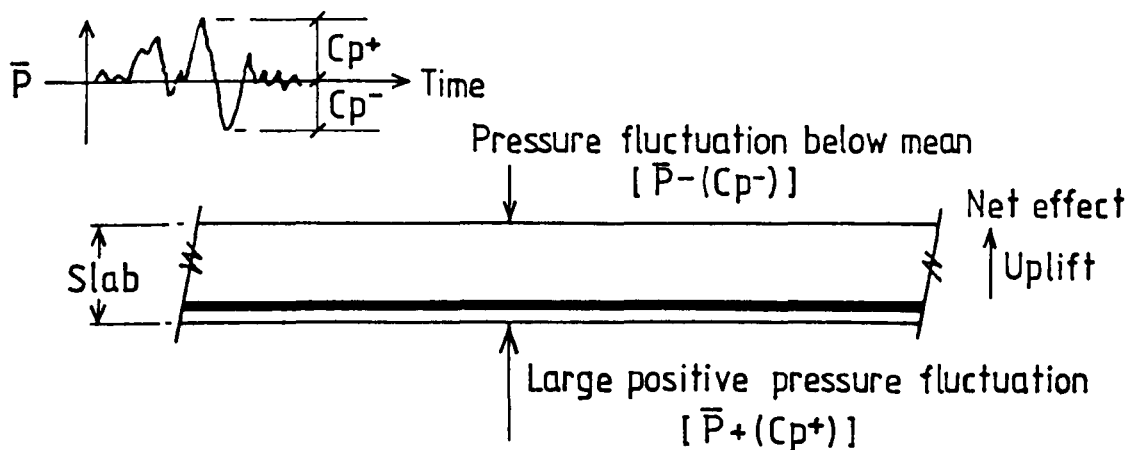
POSSIBLE LOADING ON POOL FLOOR SLAB.
